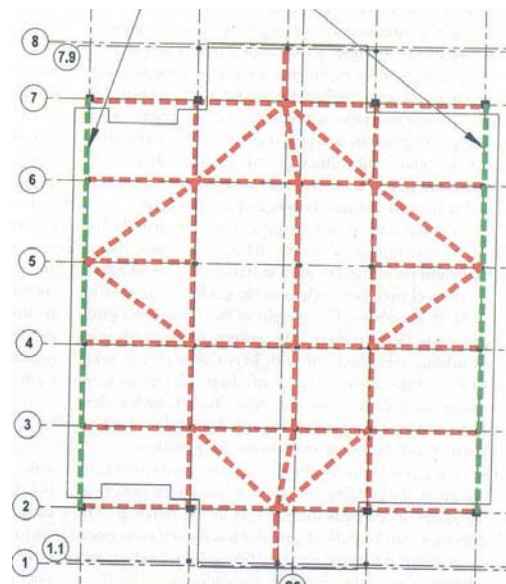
Thermal Truss, in green, located at the 28th and 51st floor, courtesy of Thornton Tomasetti
